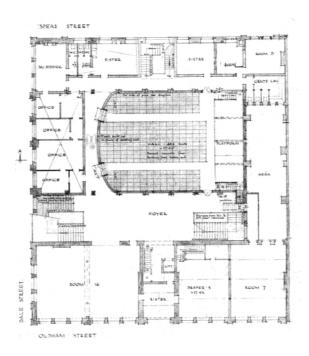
First floor plan of the reinstated hall. Source: Halliday Meecham.
